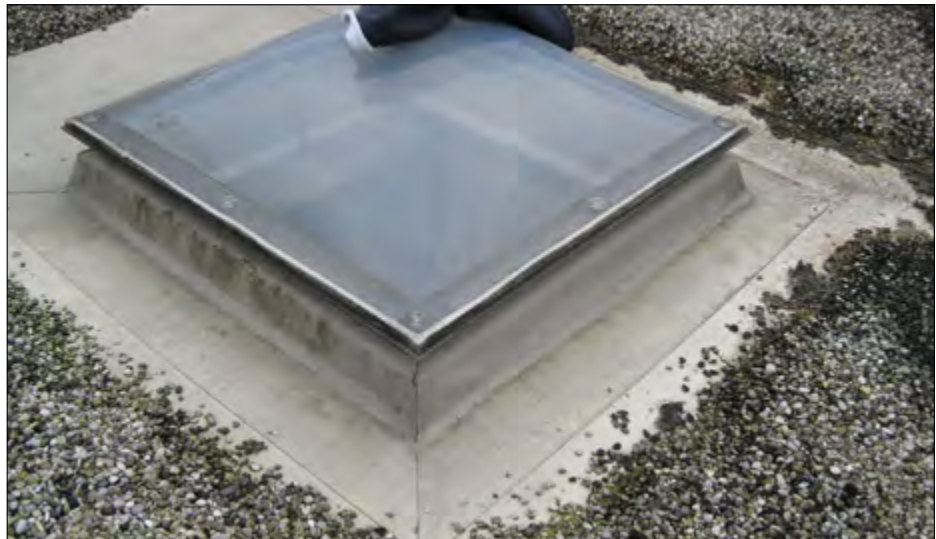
Flashing at a skylight, roof of Brunner building in Flawil (Switzerland)
